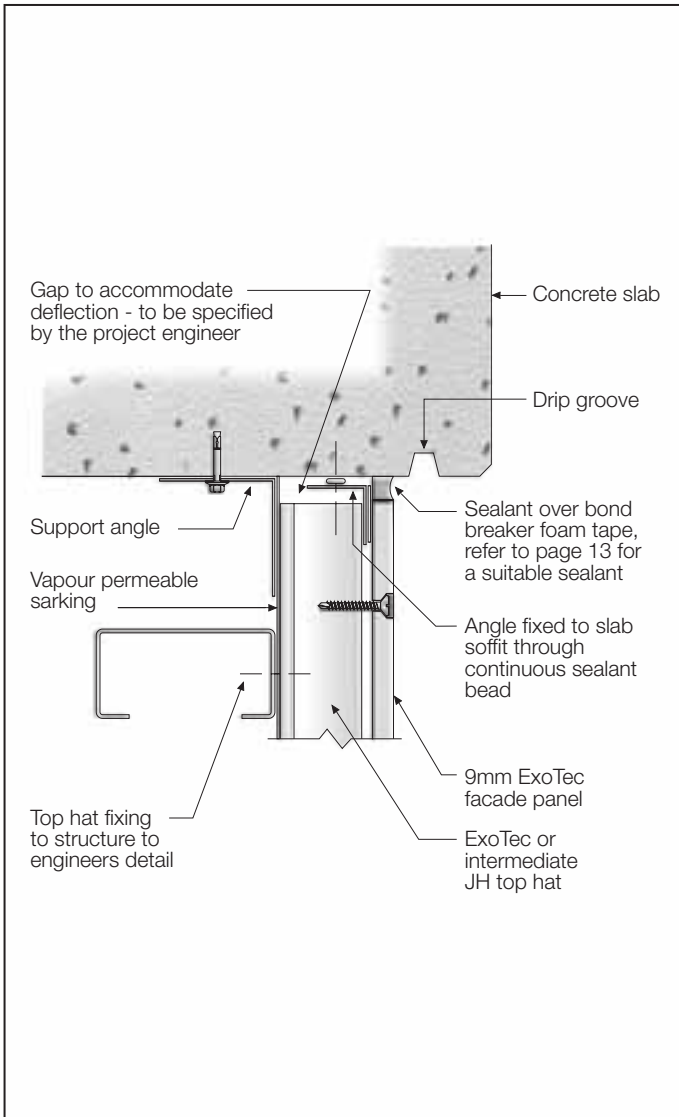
WALL DEFLECTION HEAD USED UNDER SLAB
